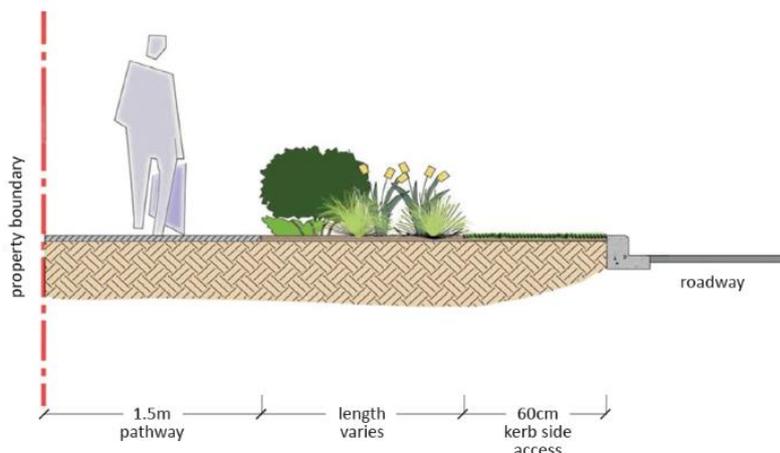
A 60cm access area must be maintained between the kerb and in ground planting.
